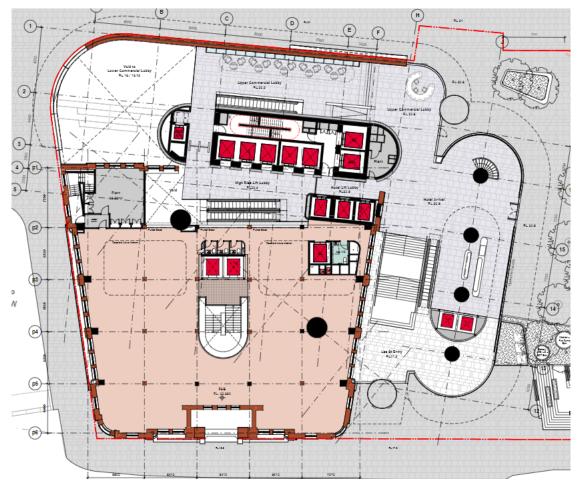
Extract from ground floor plan showing location of introduced structural columns.
